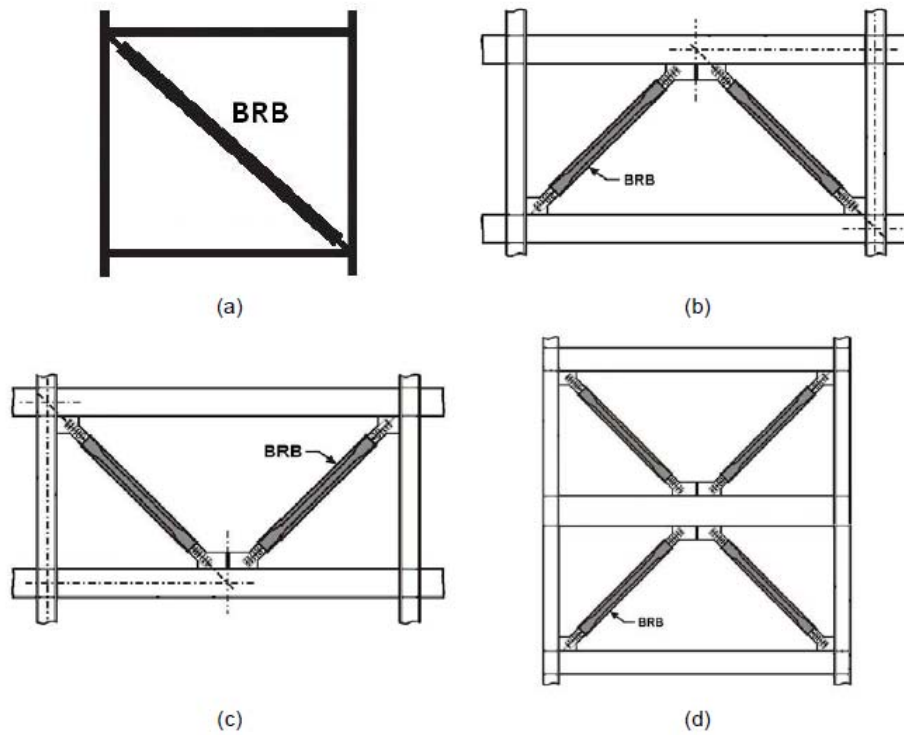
Examples of BRB bracing configurations, a) Diagonal bracing, b) Chevron bracing, c) V bracing, d) X bracing (Tremblay et.al,2004)
